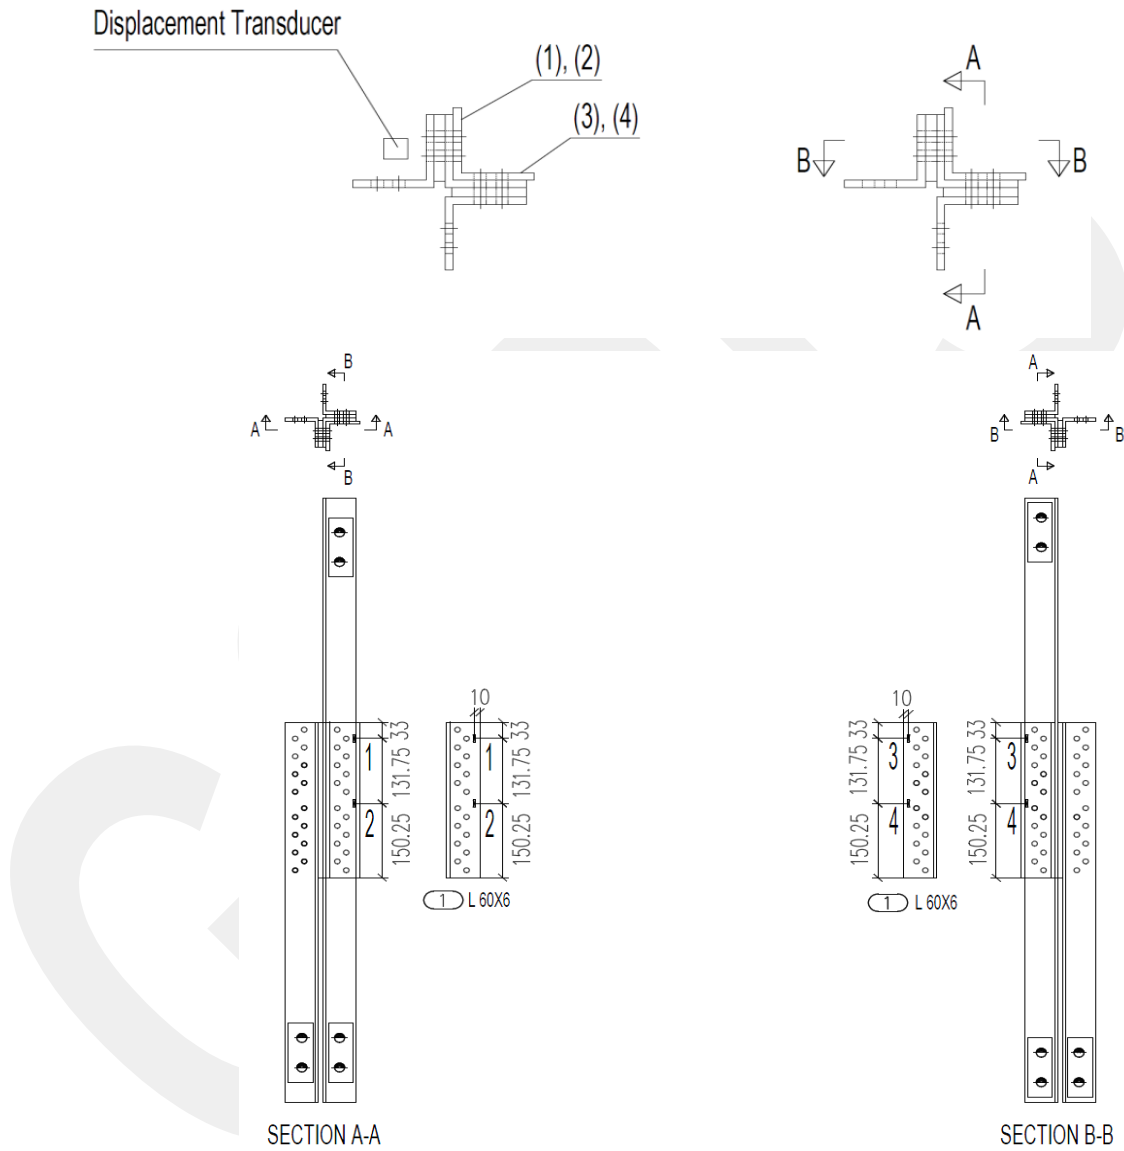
Strain gage and displacement transducer locations in side and cross-sectional view of Specimen-4 (dimensions in mm unit)
